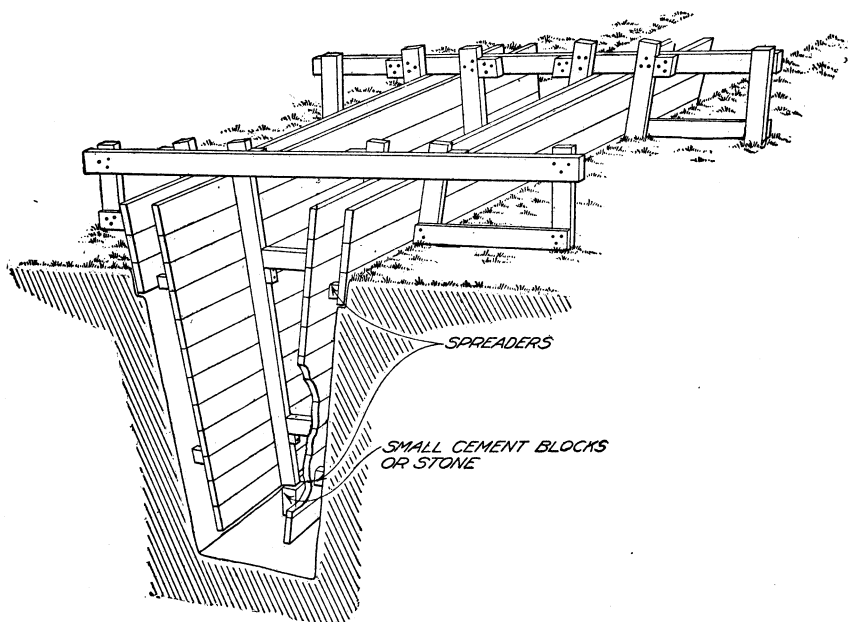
Section of trench for concrete vat with sloping sides, showing the forms in place, and one method of bracing. (Compare with fig. 14.)
